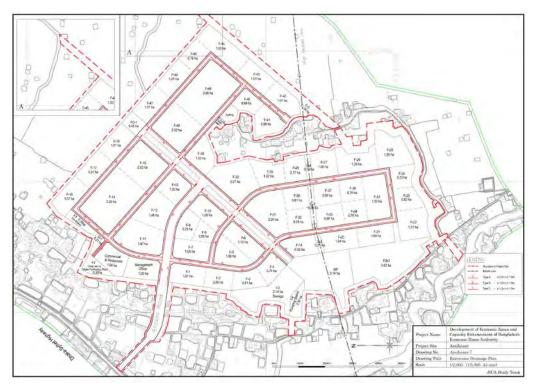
(4)-4 Araihazar rainwater drainage plan
